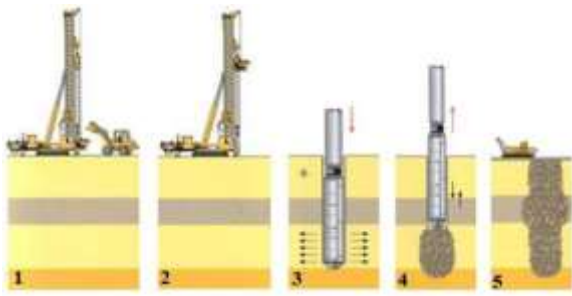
Reinforcement of the foundation soils with vertical columns of crushed stone (stone columns) [2]
